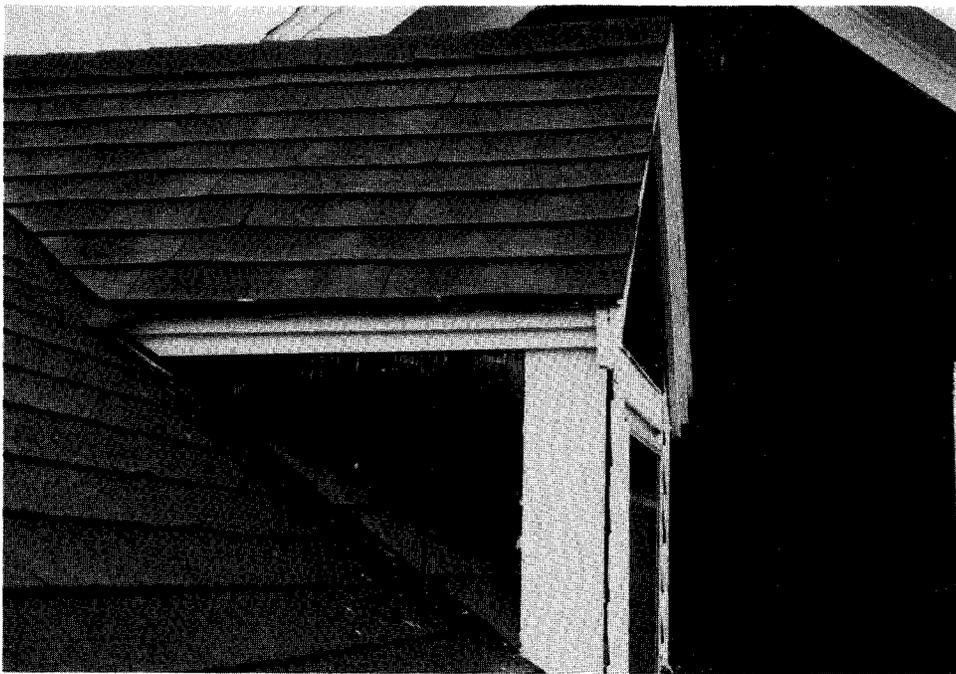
Keeper's Dwelling ell, north side of west dormer.
